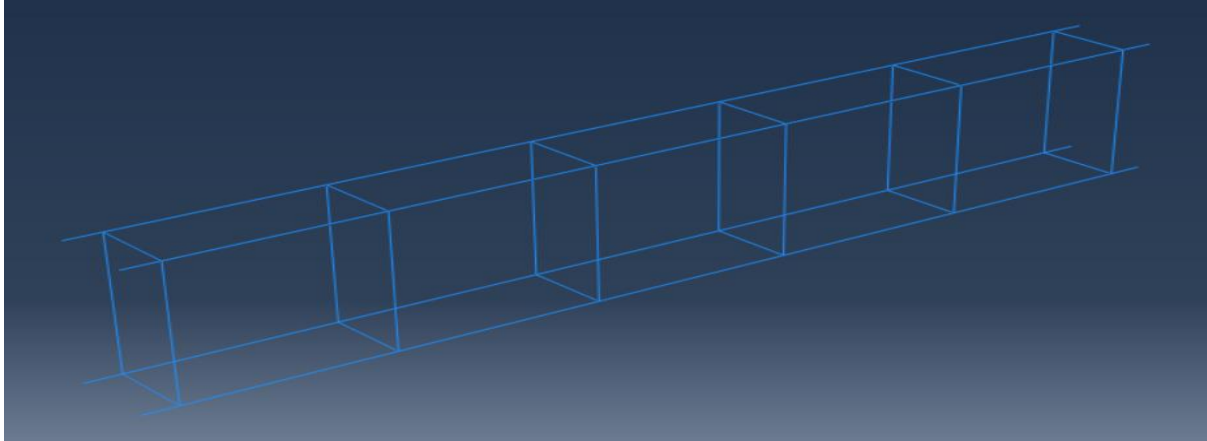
reinforcement and stirrups ϕ 8/20cm
